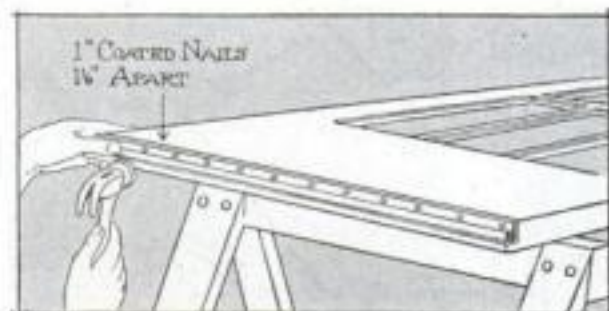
The hook on the bottom edge of the door is held in place with 1-in. coated nails.
